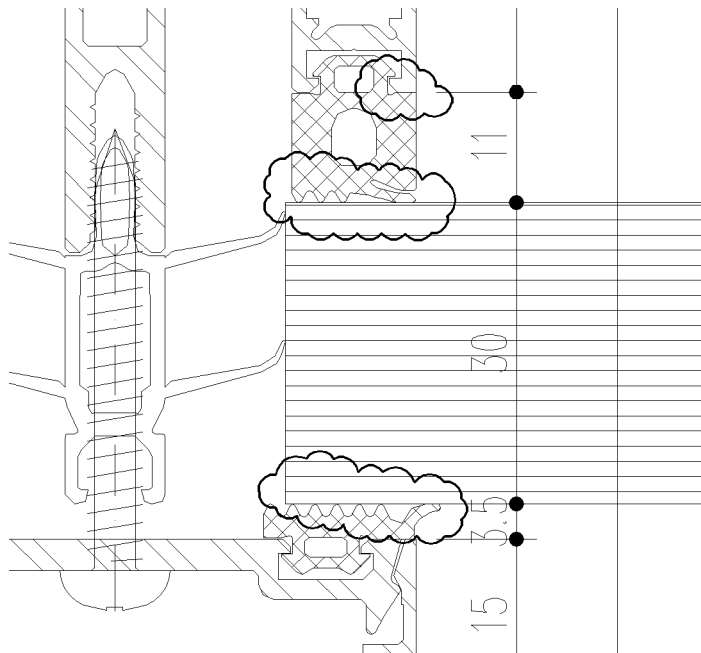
Detail of EPDM seal on a glass infill, closed cavities.
